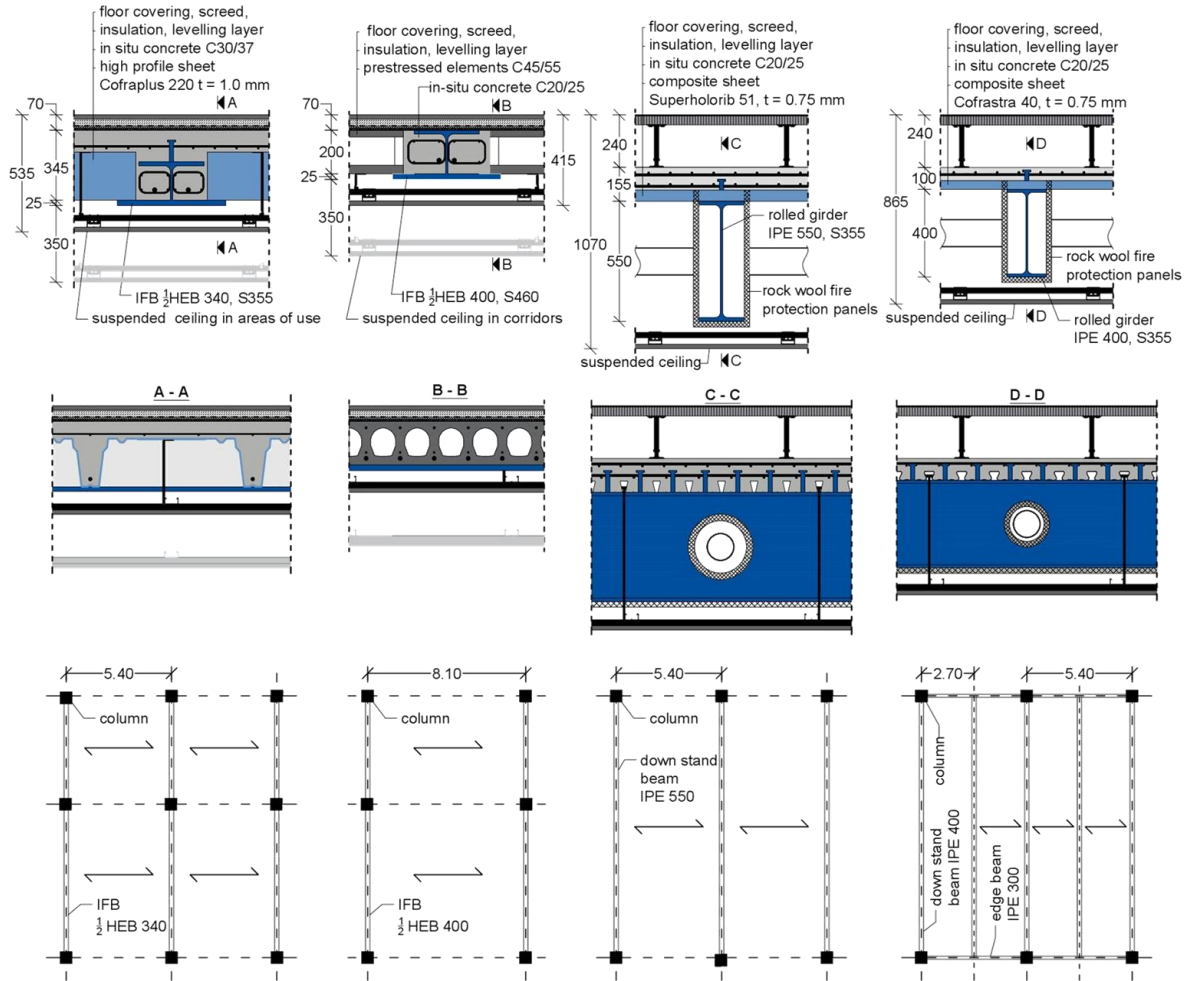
Cross and longitudinal sections; view of the ceiling systems with beam and column spacings
